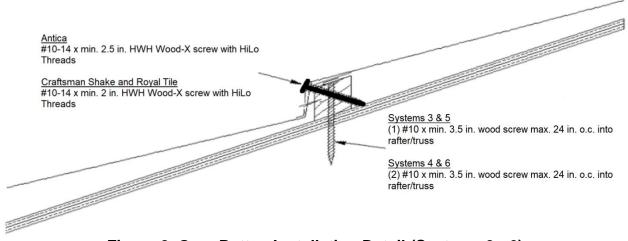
Over Batten Installation Detail (Systems 3 - 6)
